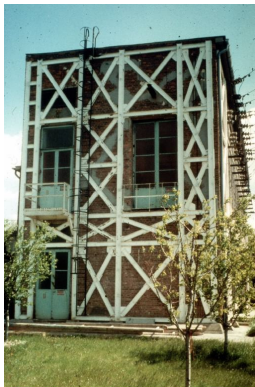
Electrical power plant, Hungary (Mazzolani) [159] by courtesy of F.M. Mazzolani
